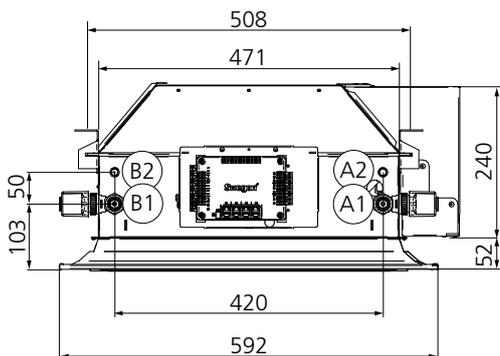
Dimensional drawing, end-view with water connections. Air connection on the long side - pos 2.
